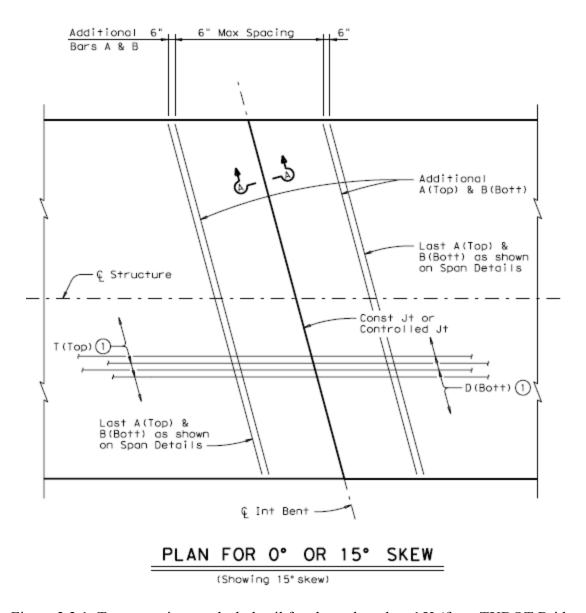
Texas continuous deck detail for skews less than 15° (from TXDOT Bridge Design Manual)
